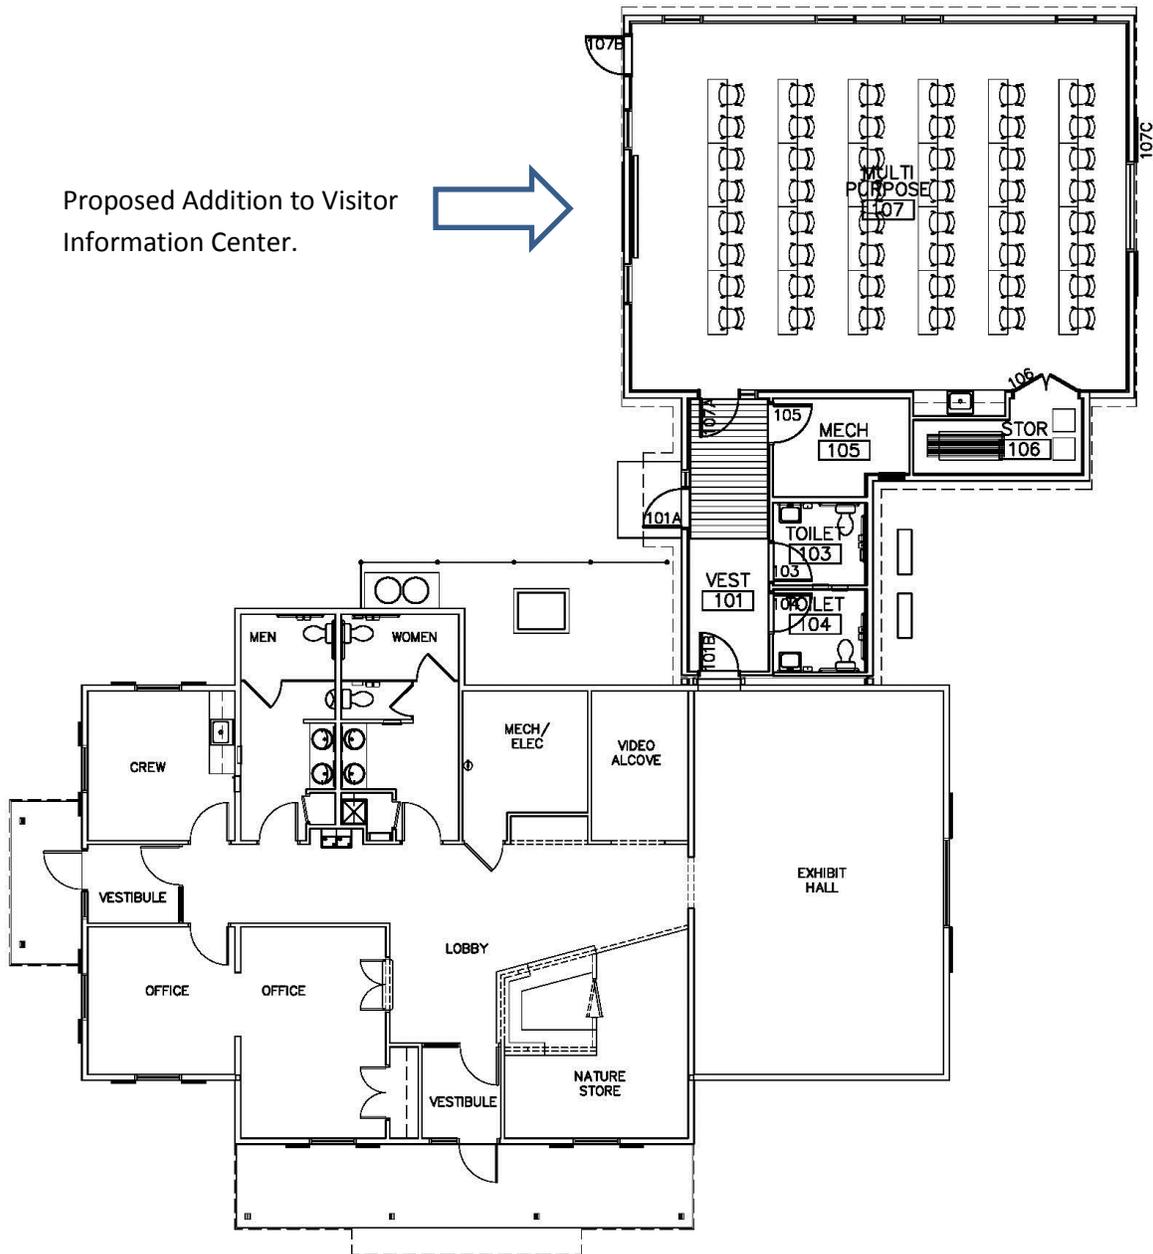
Floor Plan for the Proposed Administration Building – Phase 1 (Multipurpose Room Addition onto Visitor Information Center)
